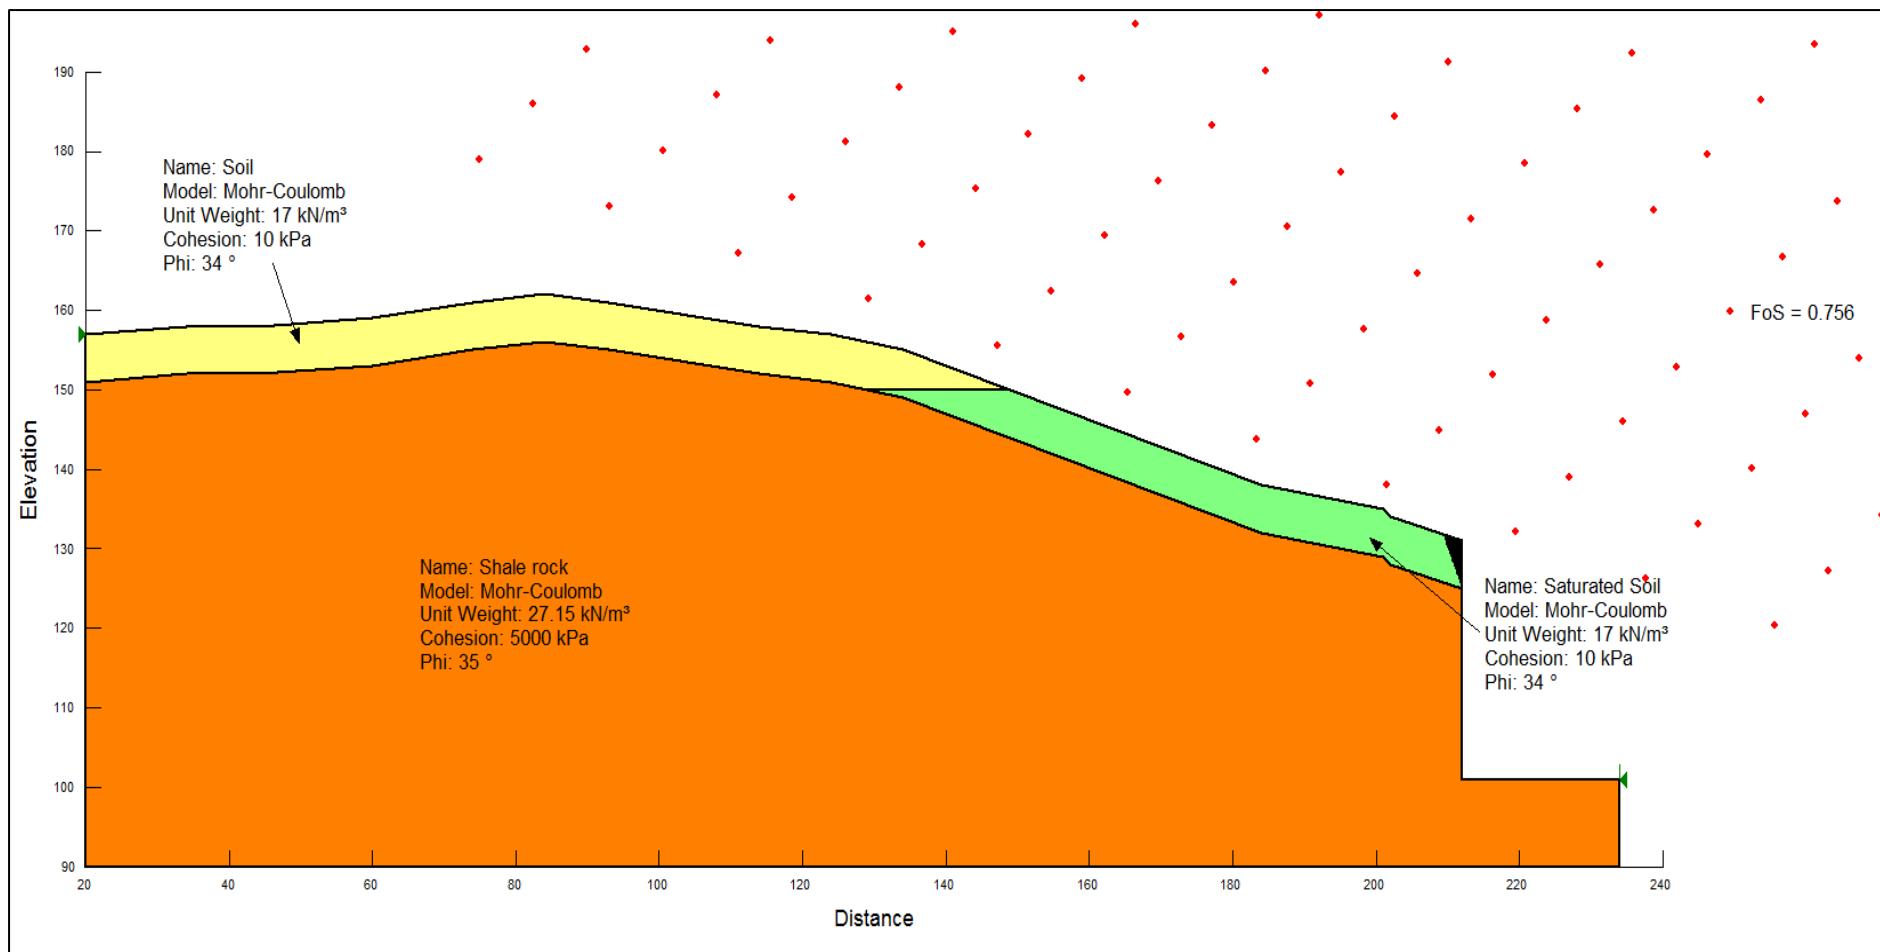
E.4: Inlet portal, Section 1, 90° excavation
